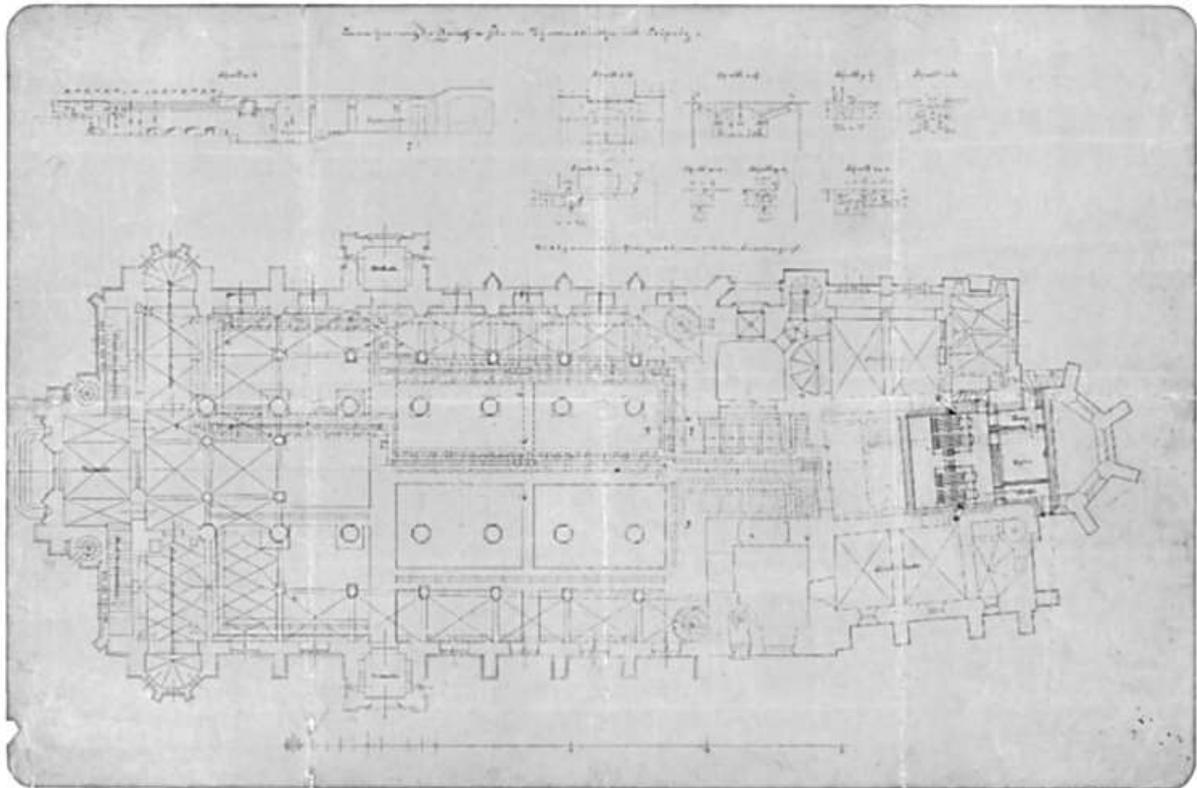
Floor plan of the *Thomaskirche* for new heating ducts
